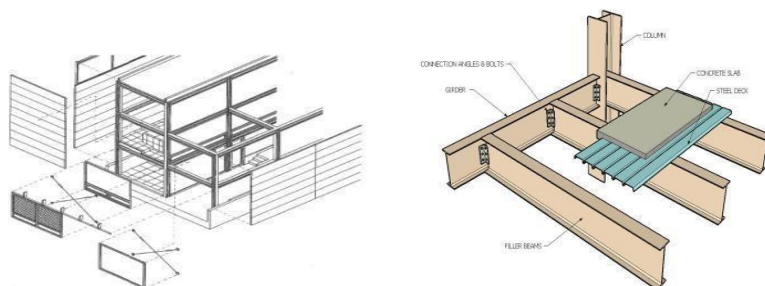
Showing the Frame Method of Construction and The Flooring System
